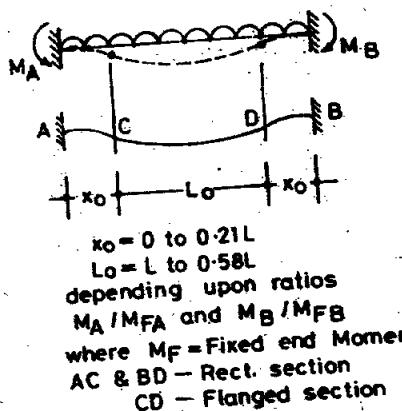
Varying M.I. in a Fixed/Continuous Beam.
